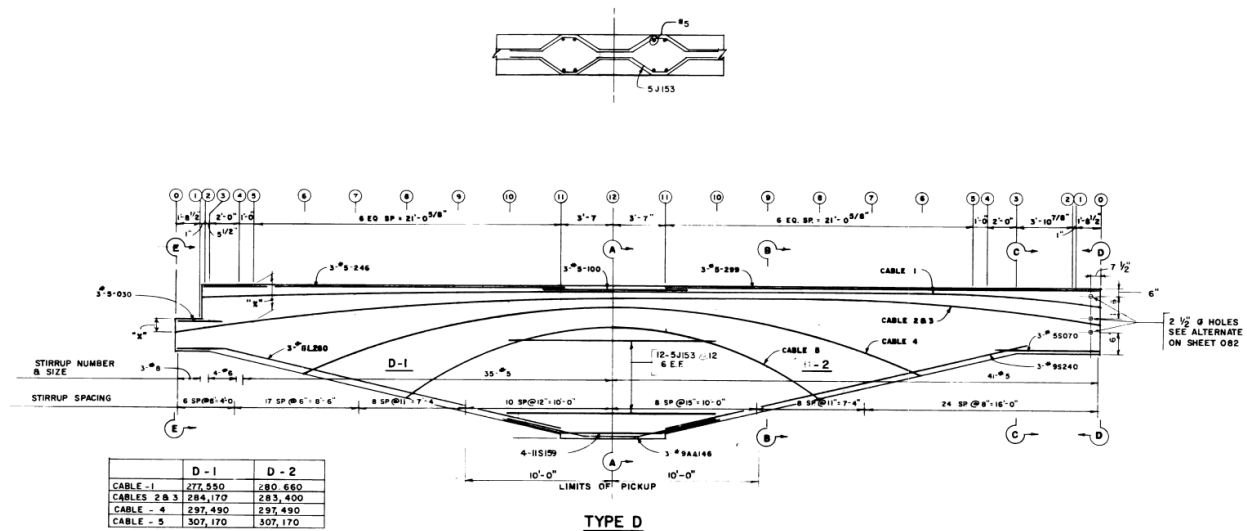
Post-tensioning layout for Type D Cantilever Beams (Sheet 78, Cantilevers Sheet-5 of original plans, 1967).
